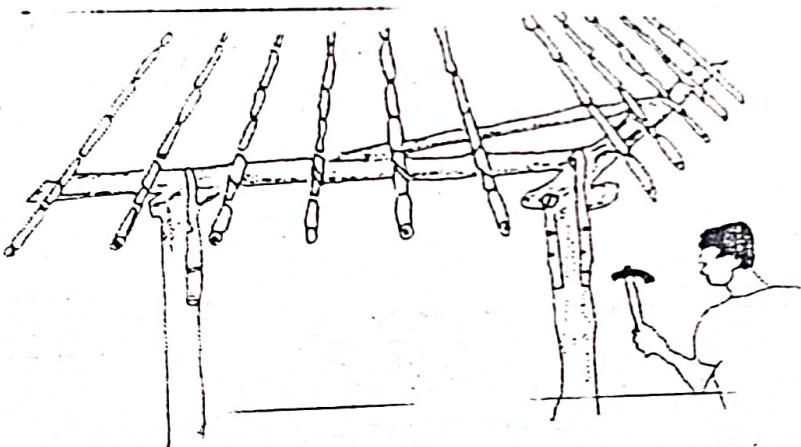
Securing roof to supporting walls and proving cross pieces at corners
